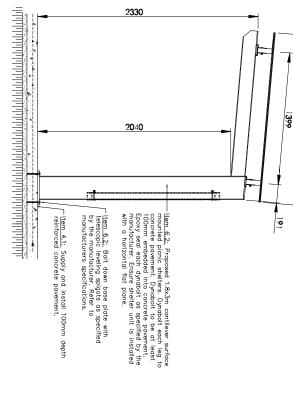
DETAIL - PROPOSED CONCRETE PAVEMENT Scale: 1:10
